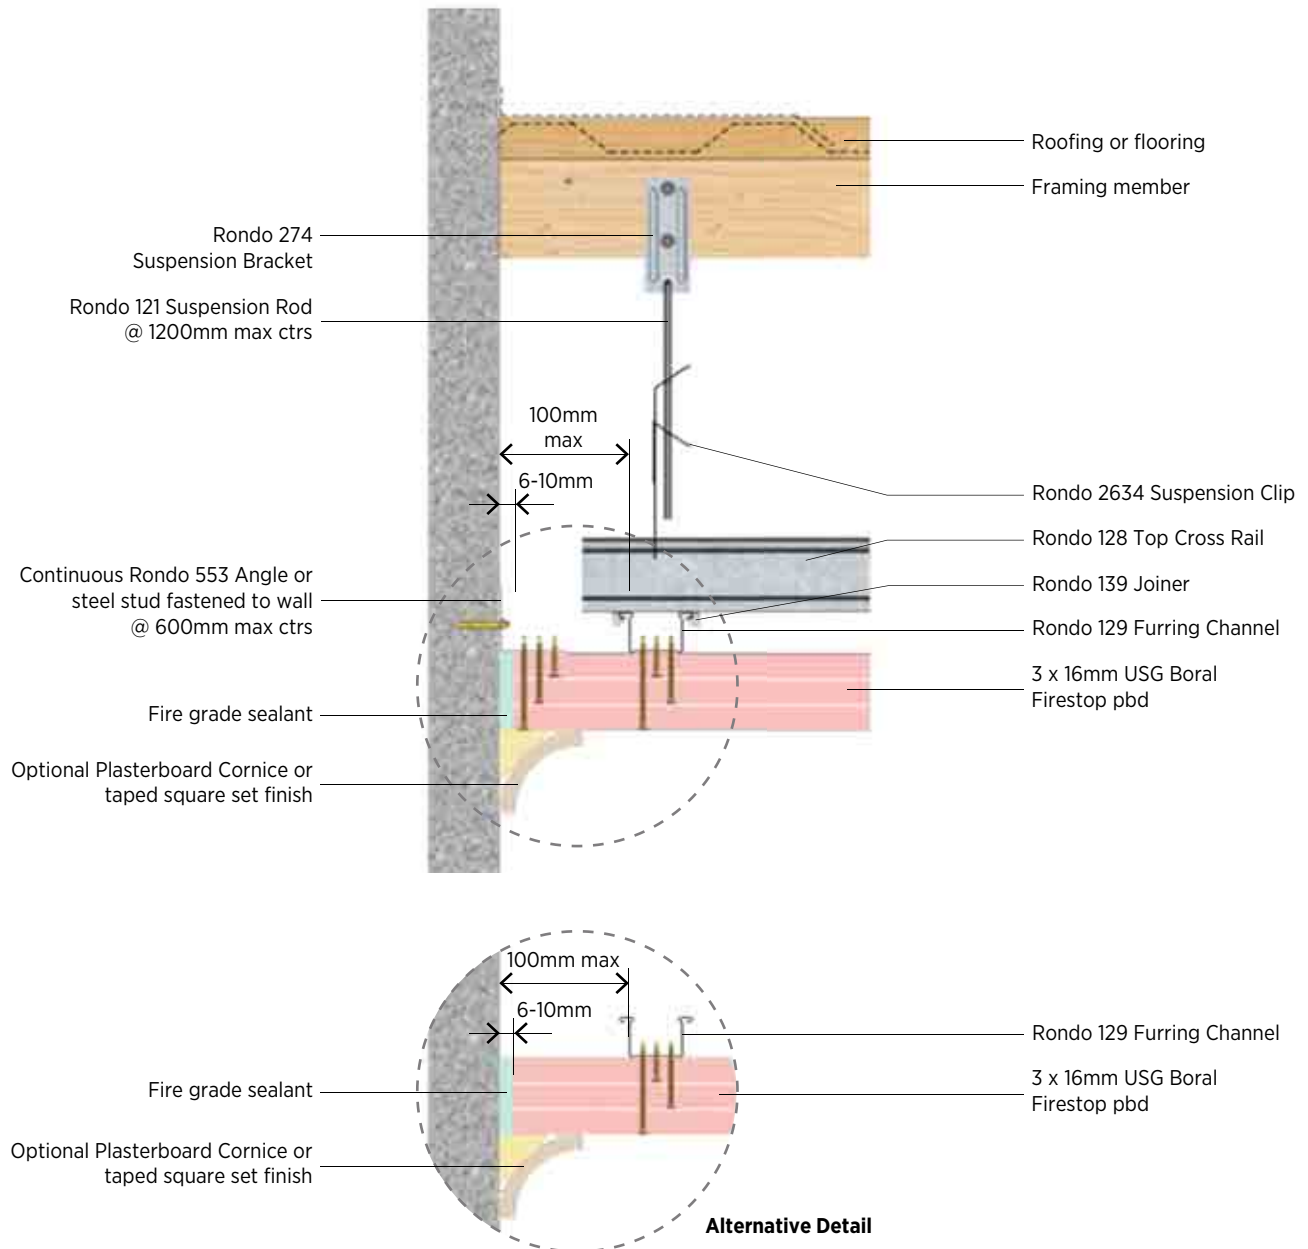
Typical Perimeter Detail - FRL 90/90/90
